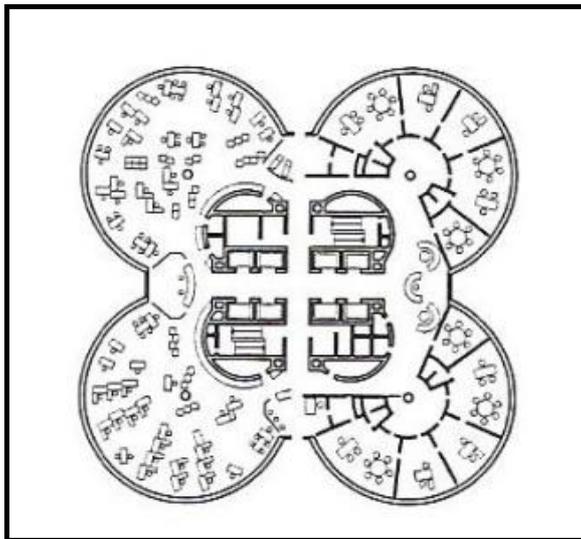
Diagrammatic plan of open - plan offices (Stanier, B & C., 2011)
